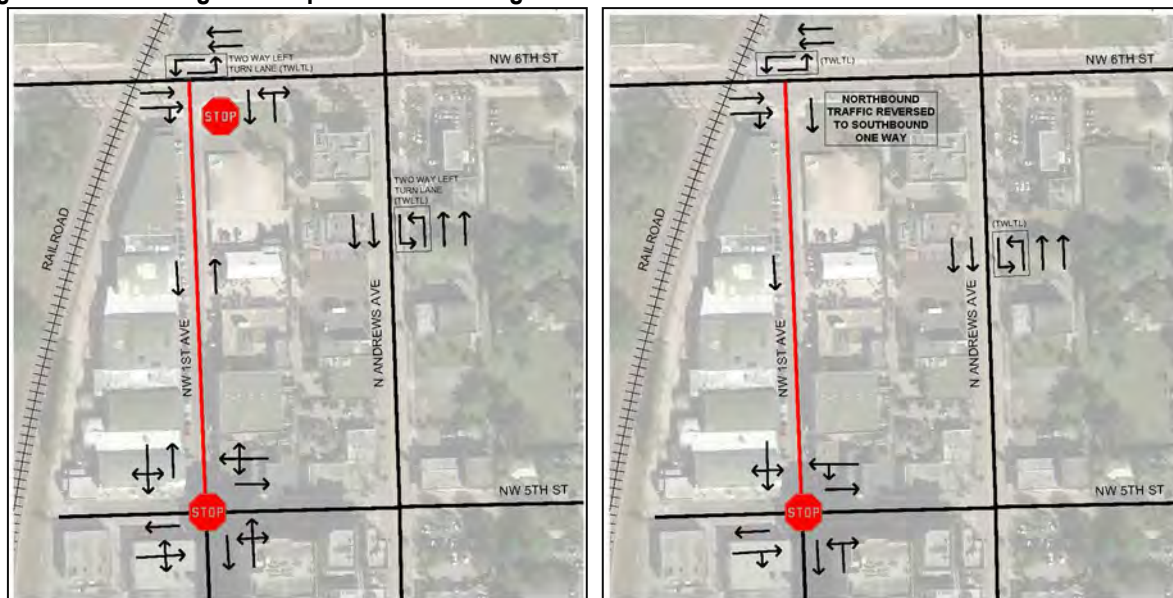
Concept Plan, NW 1<sup>st</sup> Avenue
